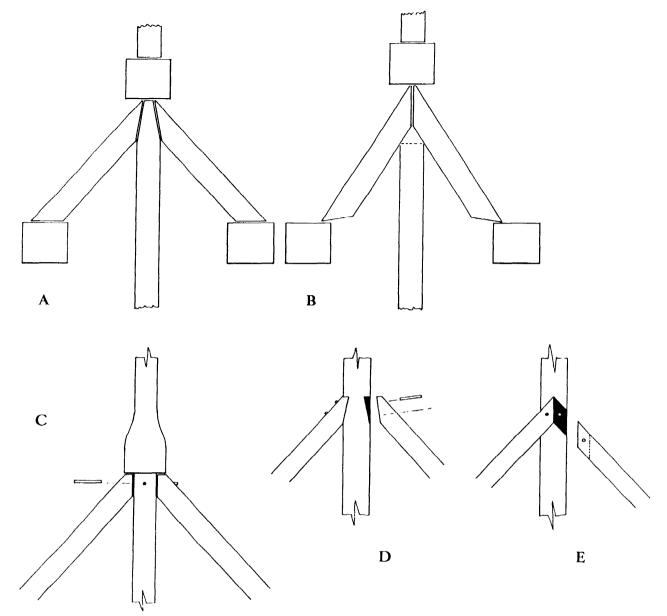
Earls Barton: diagrams to illustrate the use of carpentry joints in the pilaster-stripwork of the tower (not to scale): A, pilaster with braced lap joint; B, pilaster with mitred lap joint; C, spire mast at Sompting with wooden braces; D, wooden post with lap-jointed braces; E, wooden post with mitred and lap-jointed braces
